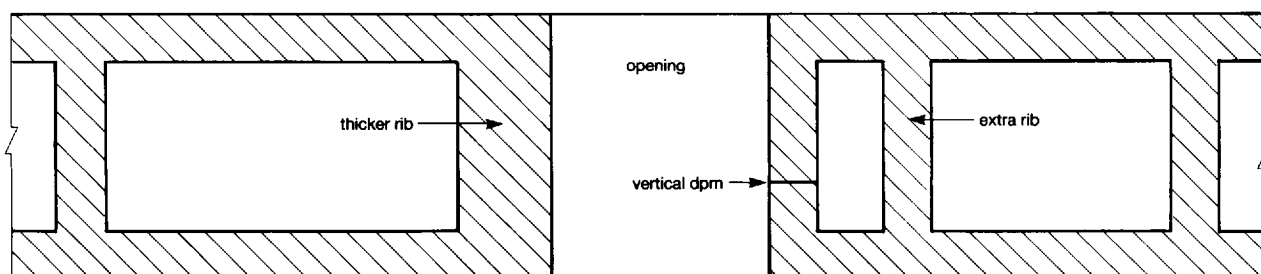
Arrangement of cross-ribs at an opening in a diaphragm wall
